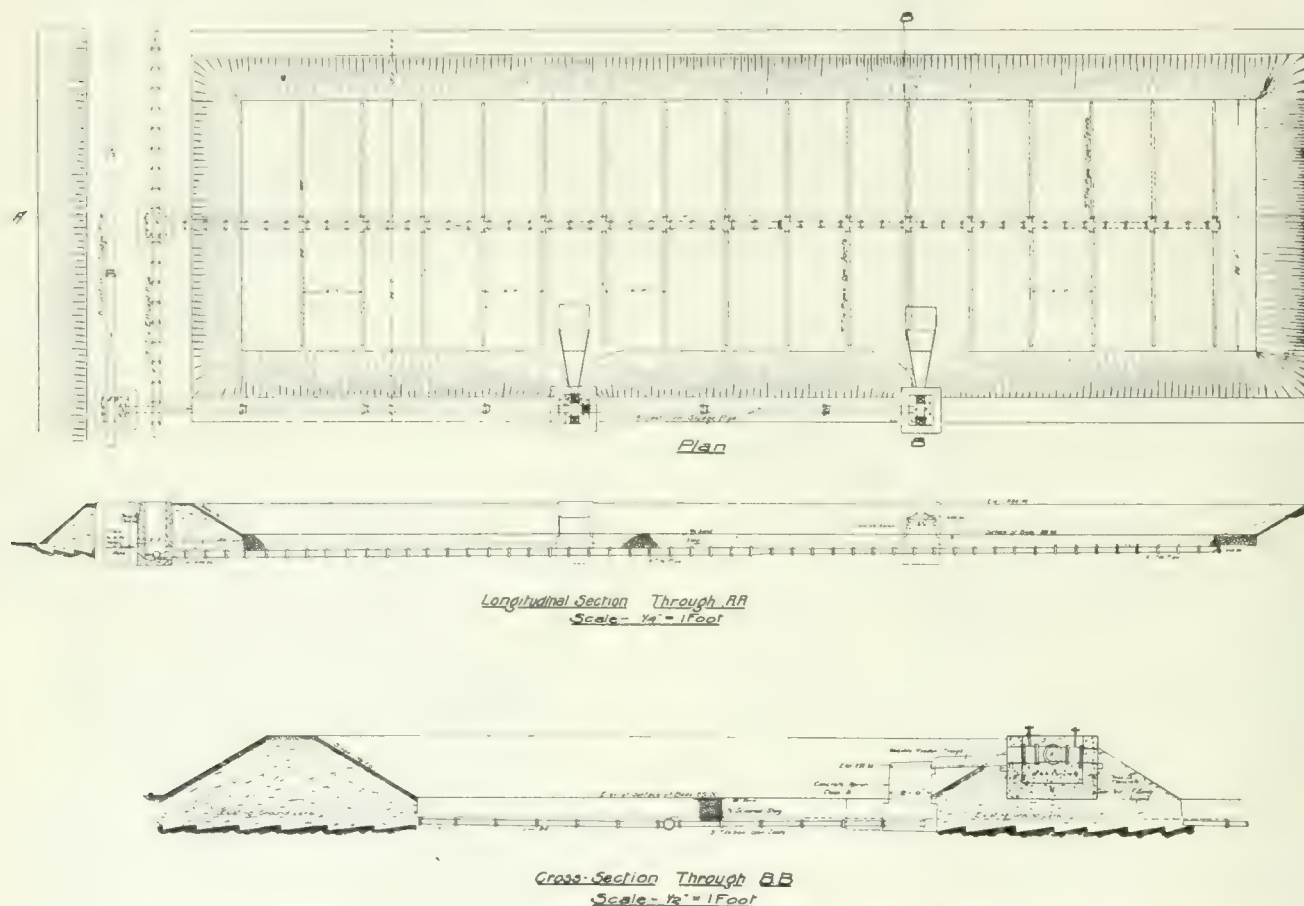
Plan and Sections of Sludge-drying Beds.
